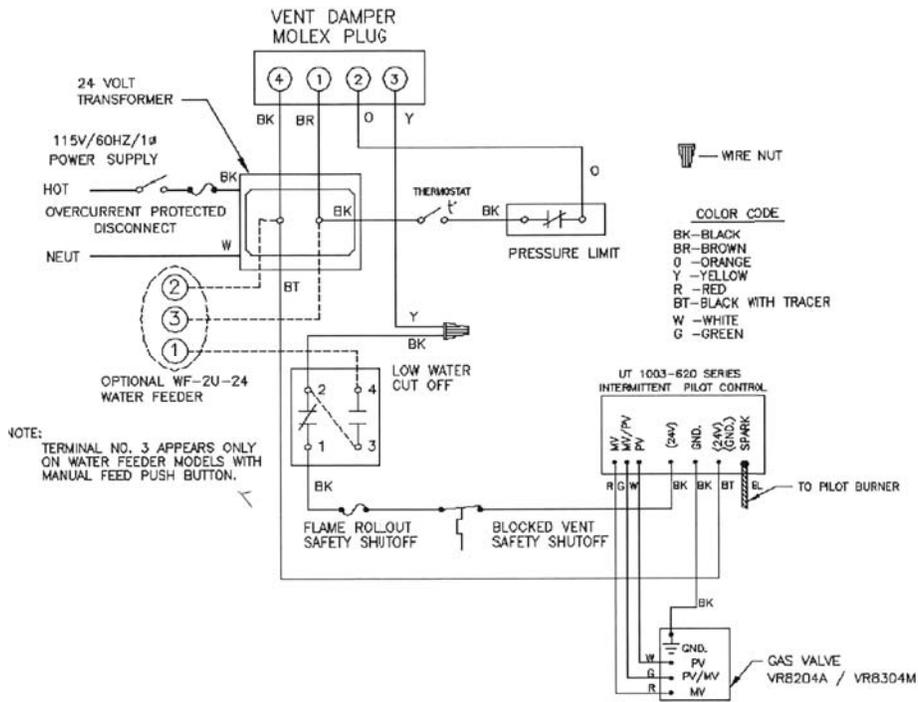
Wiring Diagrams For Boilers With PS-802 Probe Type Low Water Cut-Off
